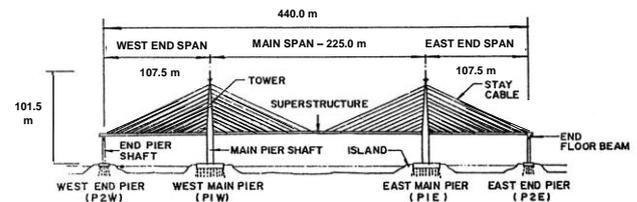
Plan of Penang Bridge (Ref. Chin, 1988)
